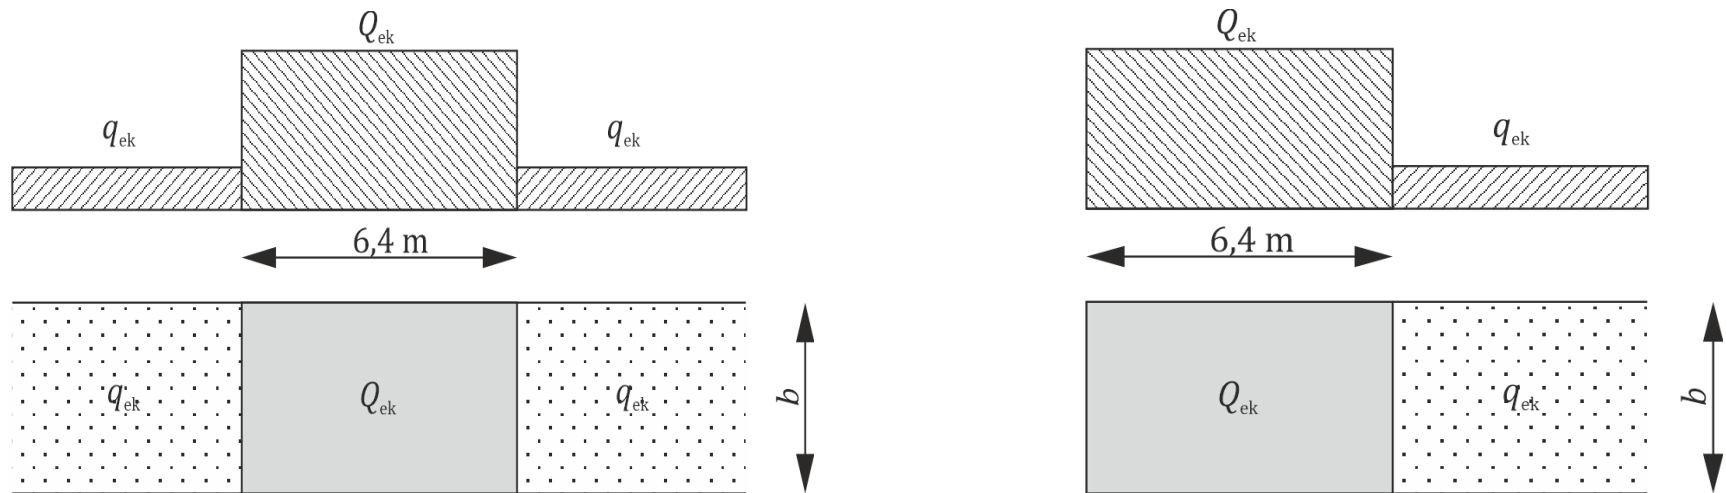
Equivalent load arrangement for Load Model 71 for geotechnical structures
